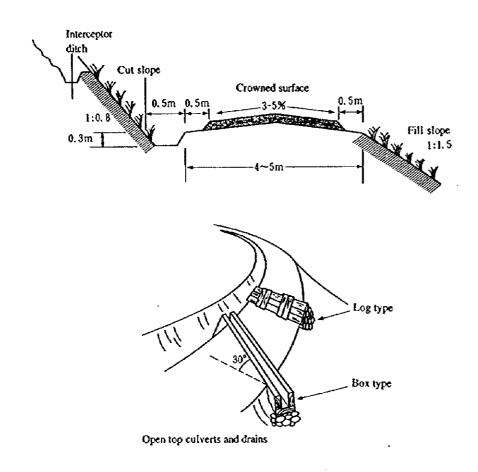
A Typical Mountain Road Cross-section and Run-off Draining Facilities
